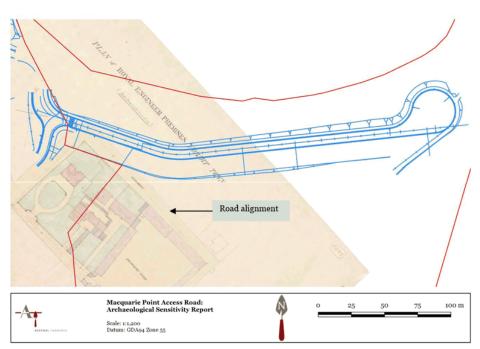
1872 plan showing the Engineers Headquarters and associated buildings, with the road alignment indicated (TAHO, PWD266/1/714, Plan-Royal Engineers Premises, Hobart. Architect, Royal Engineers, 1872, reproduced with permission).
